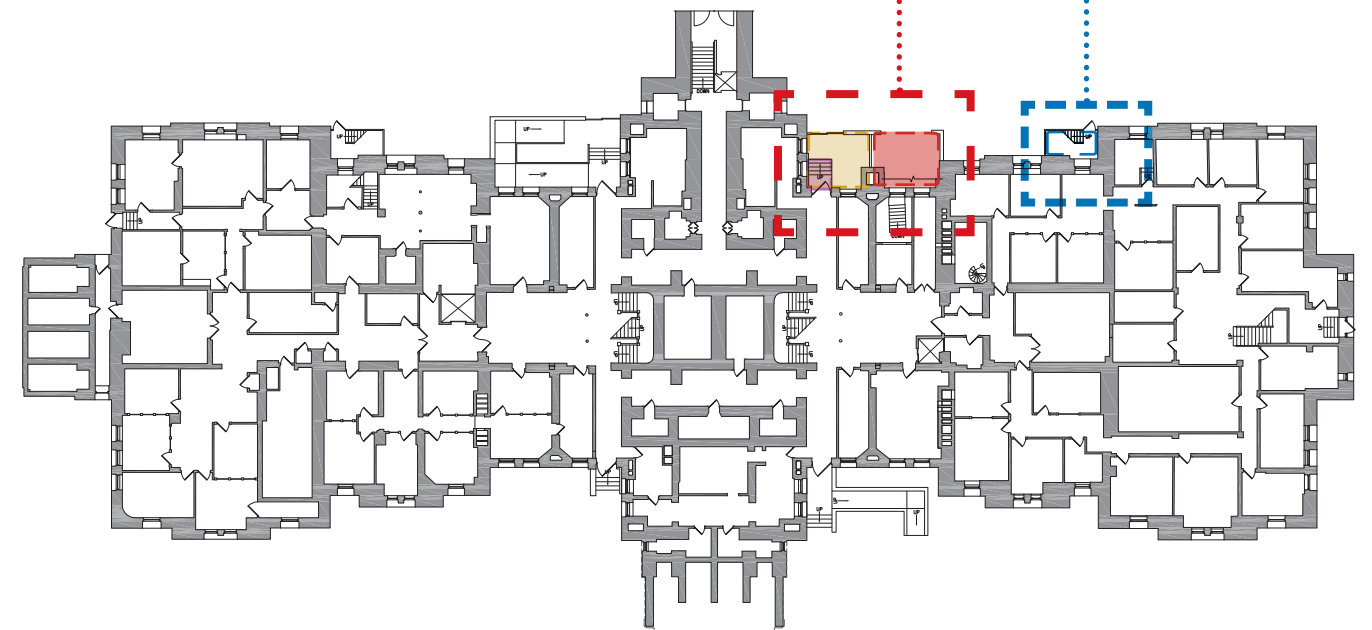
Enlarged "As-Found" Basement Level Plan and the Northeast Exterior Egress Stair.
